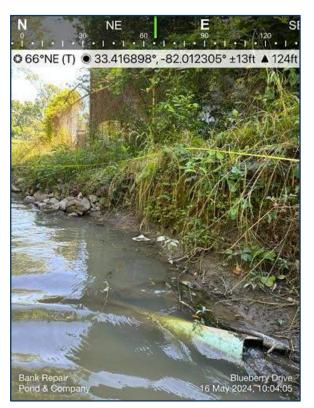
Looking downstream at right bank; active streambank erosion adjacent to metal building.
